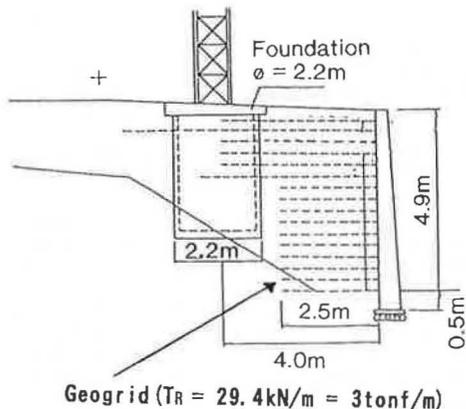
Typical cross-section of GRS-RW's for the Kobe Line at Amagasaki (No. 7, Fig. 3)
